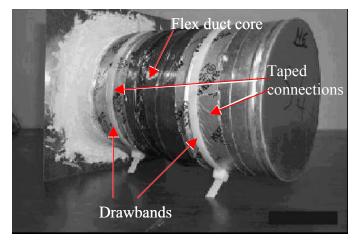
Example of test sample showing the two taped connections and the mechanical clamps.
